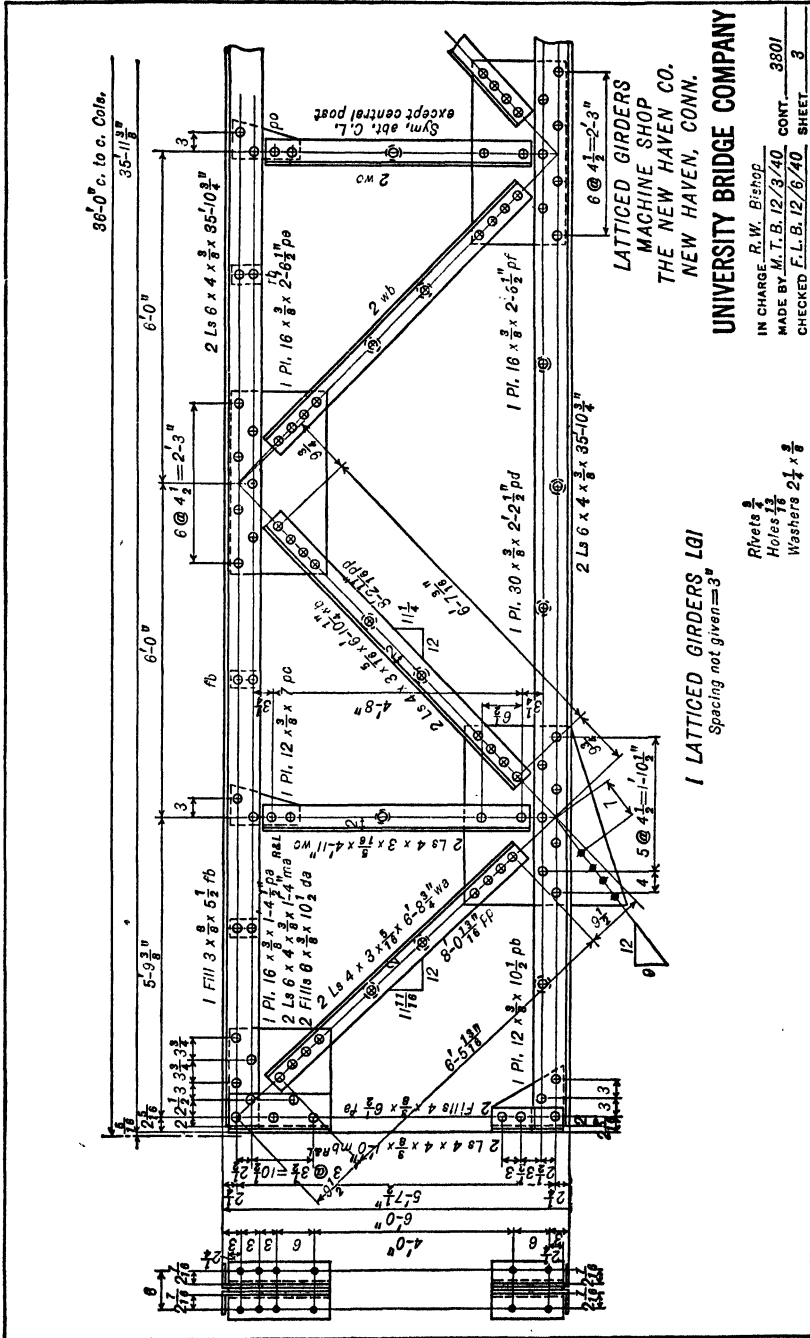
Lapped Girder with Working Lines Meeting in Common Points.
